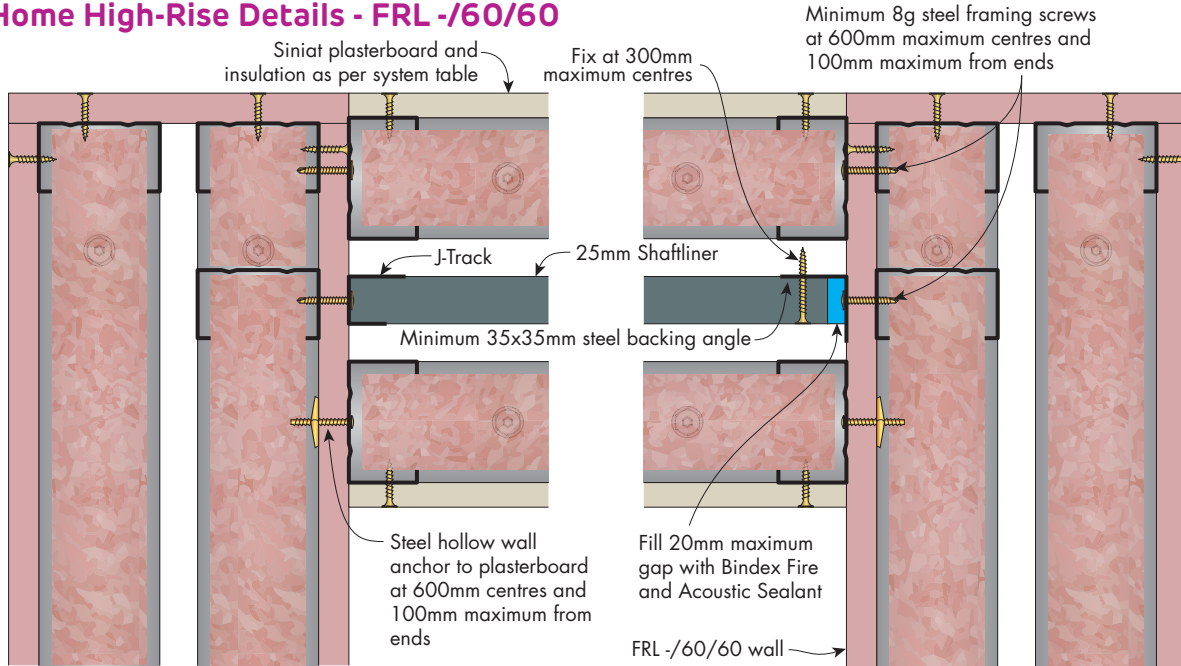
Corridor Wall to Inter-tenancy Wall Junction
